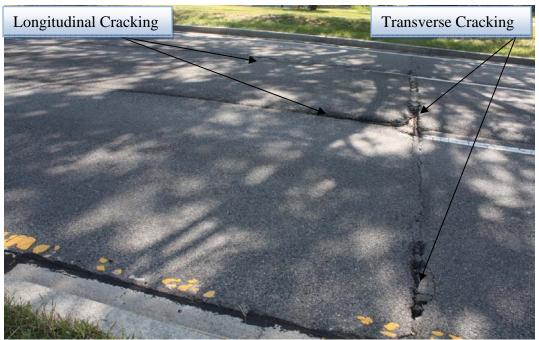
Severe Transverse and Longitudinal Reflective Cracking in Untreated Pavement Section
